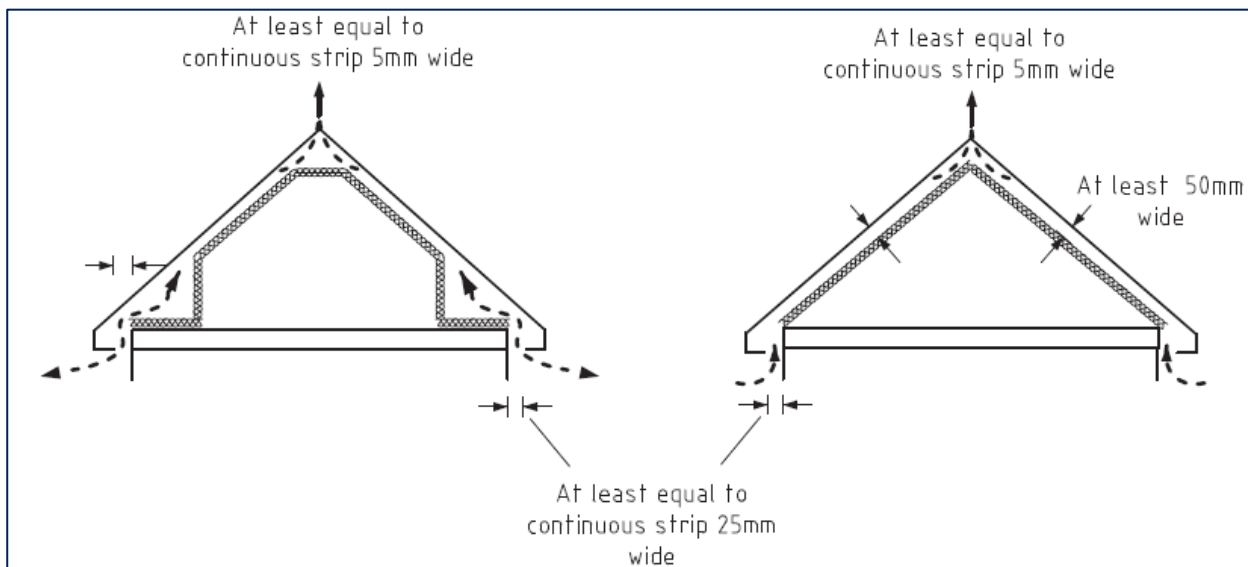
Typical Ventilation setup for Insulation Installed at Rafter Level
